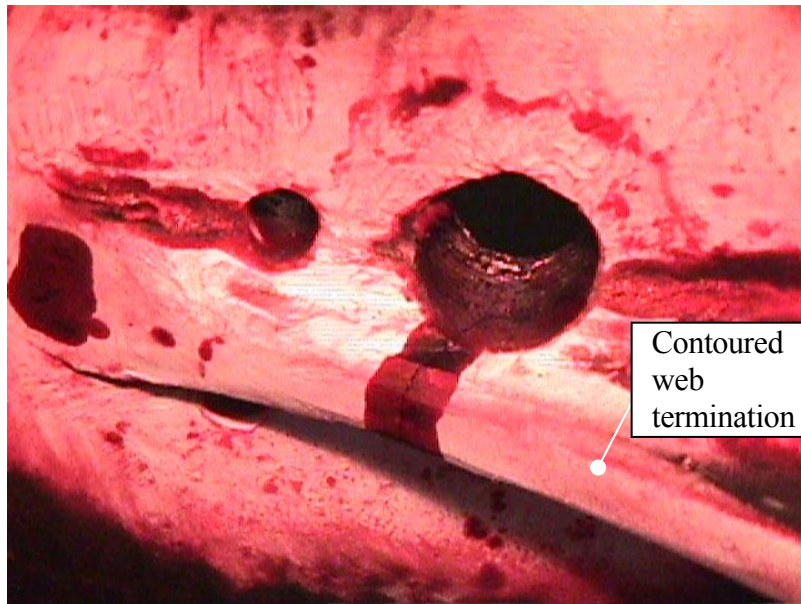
Detail of crack occurring in full penetration weld with tips drilled out.
